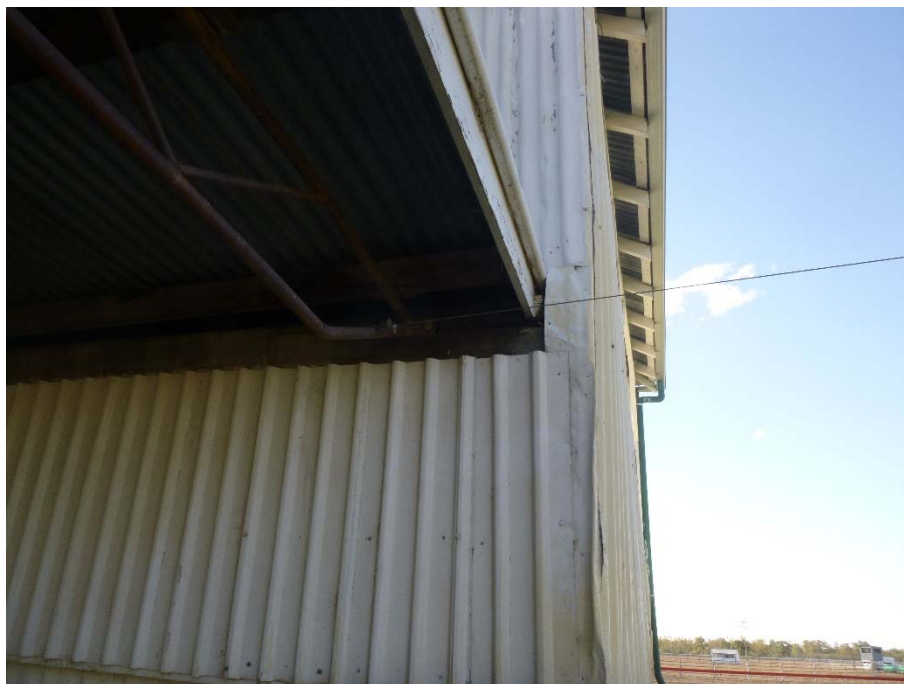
The timber beam where the bar area connects has split at the eastern end.
